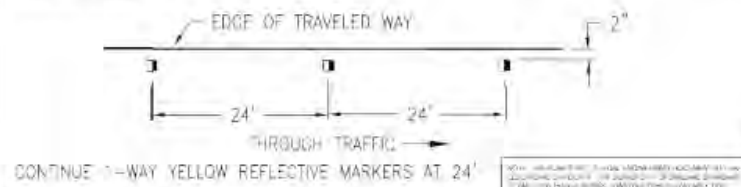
LANE LINE EXTENSIONS THROUGH INTERSECTIONS
